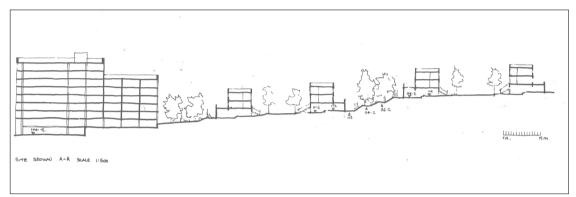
Alternative Layout 3 (Option B), Contiguous Elevation Stocking Avenue [Source: RAU 2020]
